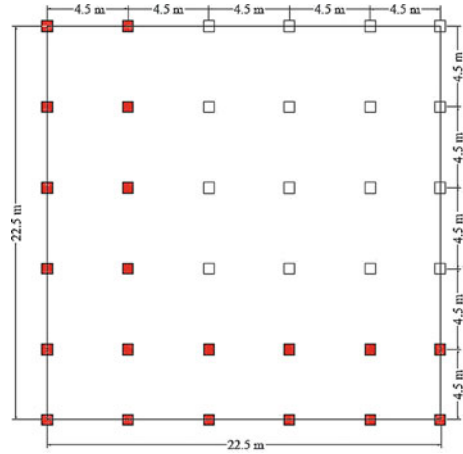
Plan for typical floor of G+3 storey RCC biaxial asymmetric building No. 7 with 4.7% asymmetry in plan in each direction
